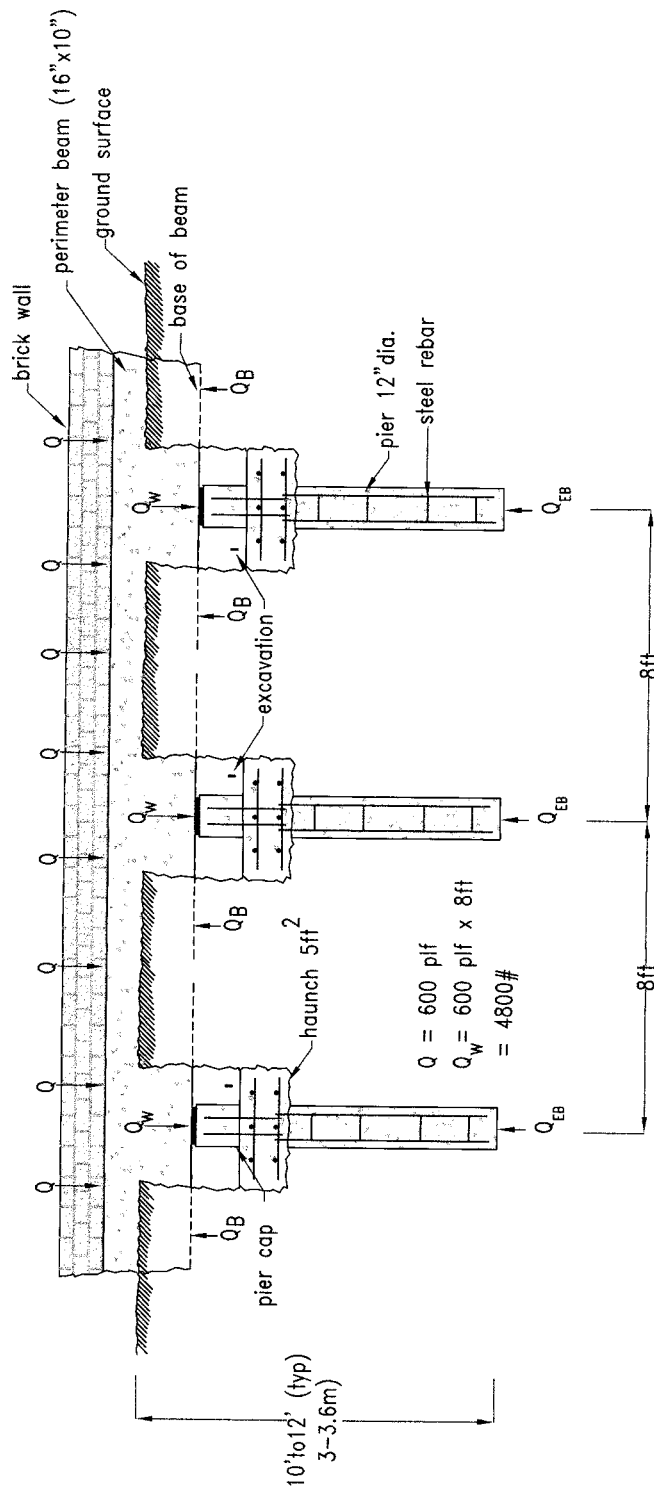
B.4.19. Load evaluation of concrete beam during underpinning. Note: During the raise, jacks are set on the haunch and used to lift the beam. At, or near, the conclusion of the raise, the concrete beam is not likely to have contact with the supportive soil ($Q_B = 0$). (This contact is ultimately restored by mudjacking in the event of slab foundations.) The pier caps are removed and the excavation back filled to complete the underpinning operation. [Steel pipes (1 1/4 in I.D.) are frequently used to temporarily support the beam to allow for both the removal of the jacks and the proper cure of the concrete pier caps.]
